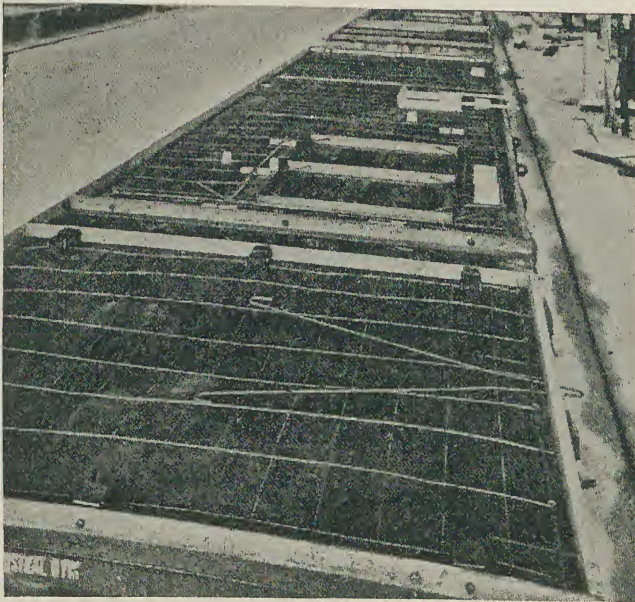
MOULDS READY FOR PLACING CONCRETE FOR COMPLETE WALL.
